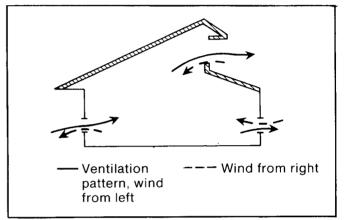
Whole-House Ventilation Through Clerestory Windows
